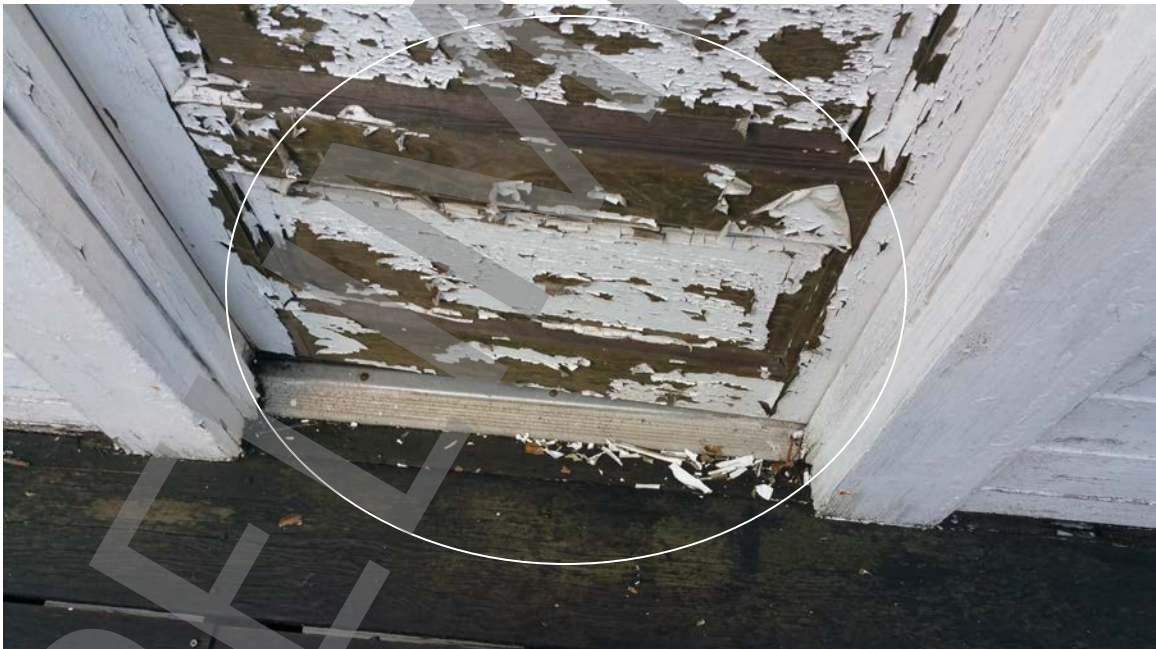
Rotten door with peeling lead paint, and chips on the ground, at main house back door.
